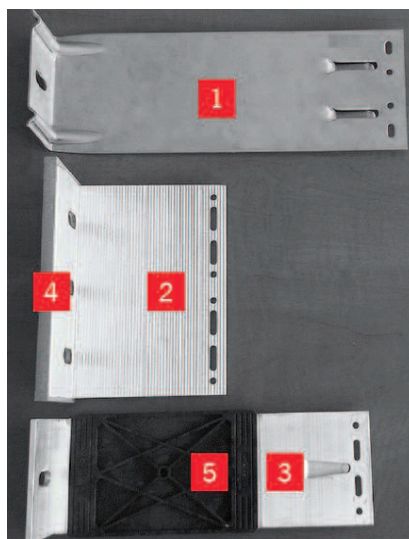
Brackets for ventilated facades: 1 – solid steel bracket; 2 – solid aluminum bracket with thermal insulation spacer; 3 – bracket with polymer element (so-called „passive”); 4 – thermal spacer attached to the base; 5 – polymer element located between two aluminum elements
